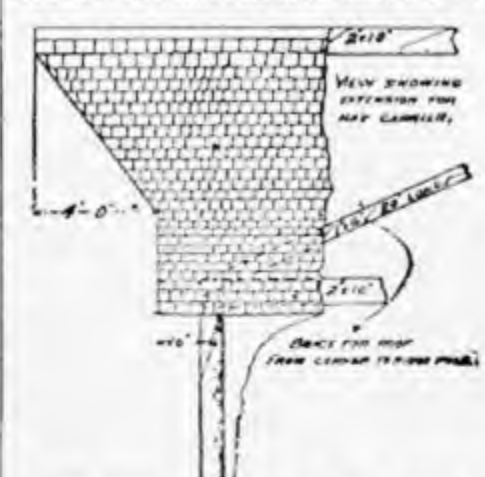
Section of Roof, Showing Extension for Hay-Carrier Track and Plan for Bracing Roof.
